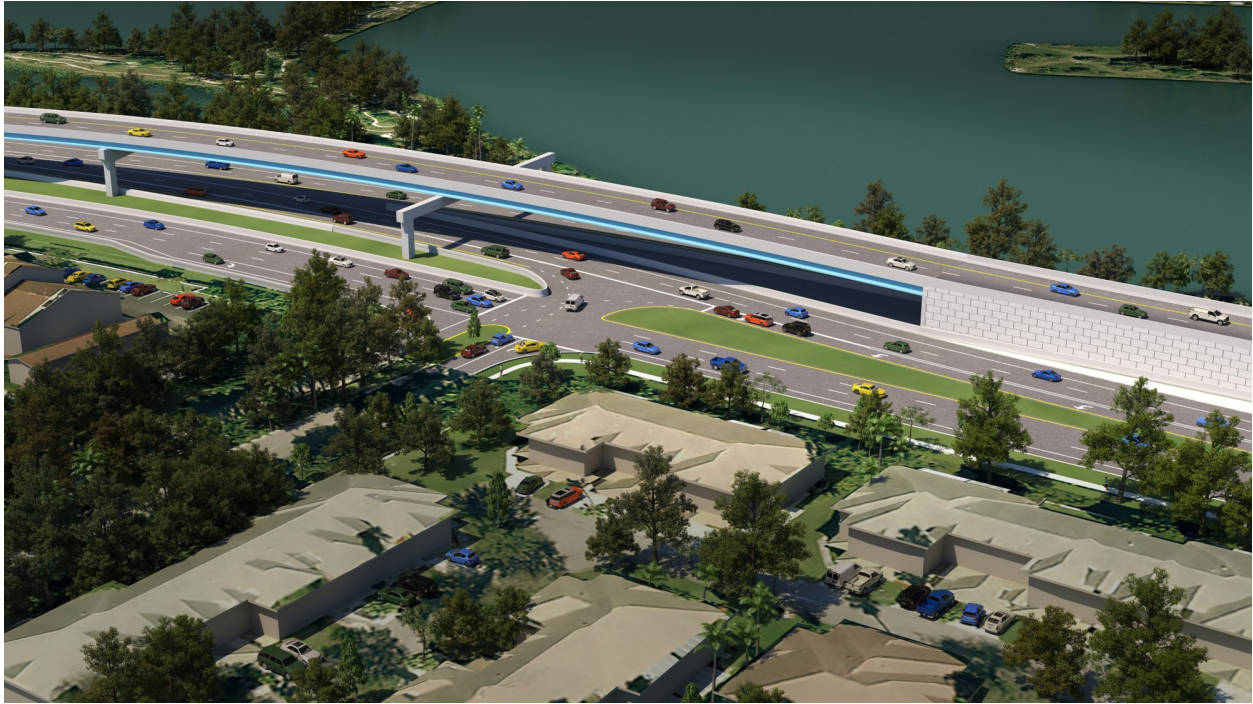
North Alternative-Looking Southwest at Powerline Road
